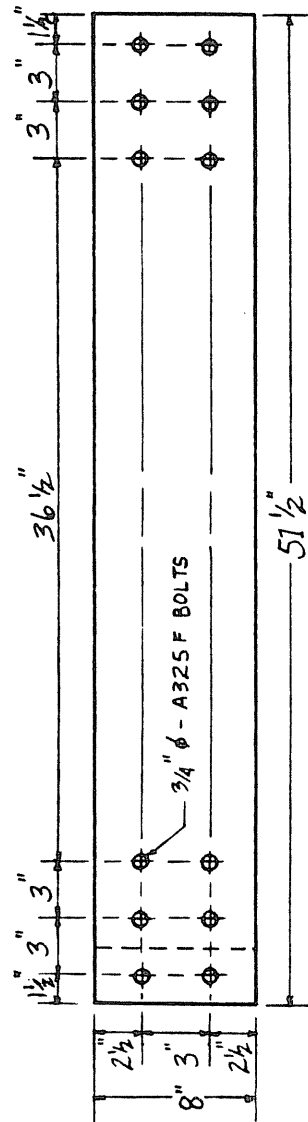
RAFTER-TO-COLUMN CONNECTION END-PLATE,
